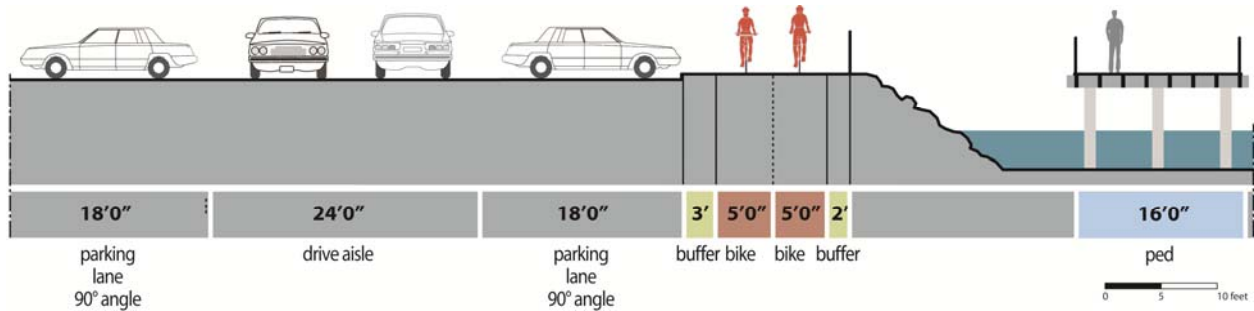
Segment 1D Parking Lot 3 North Proposed Improvements
